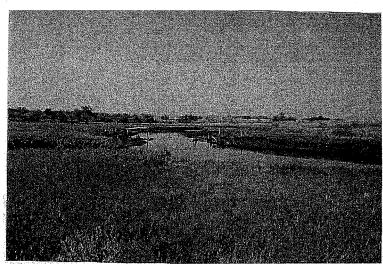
Figure XXVI: Looking South Towards Flynn (?) Causeway/Foot Bridge
